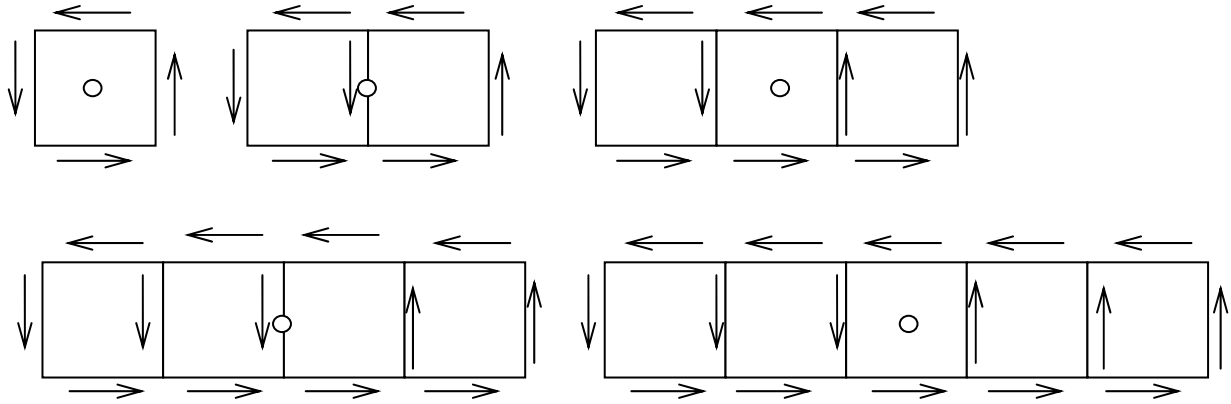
RISA-2D BEAM ELEMENT LAYOUT PATTERN FOR 1, 2, 3, 4 AND 5-SPAN CULVERTS
